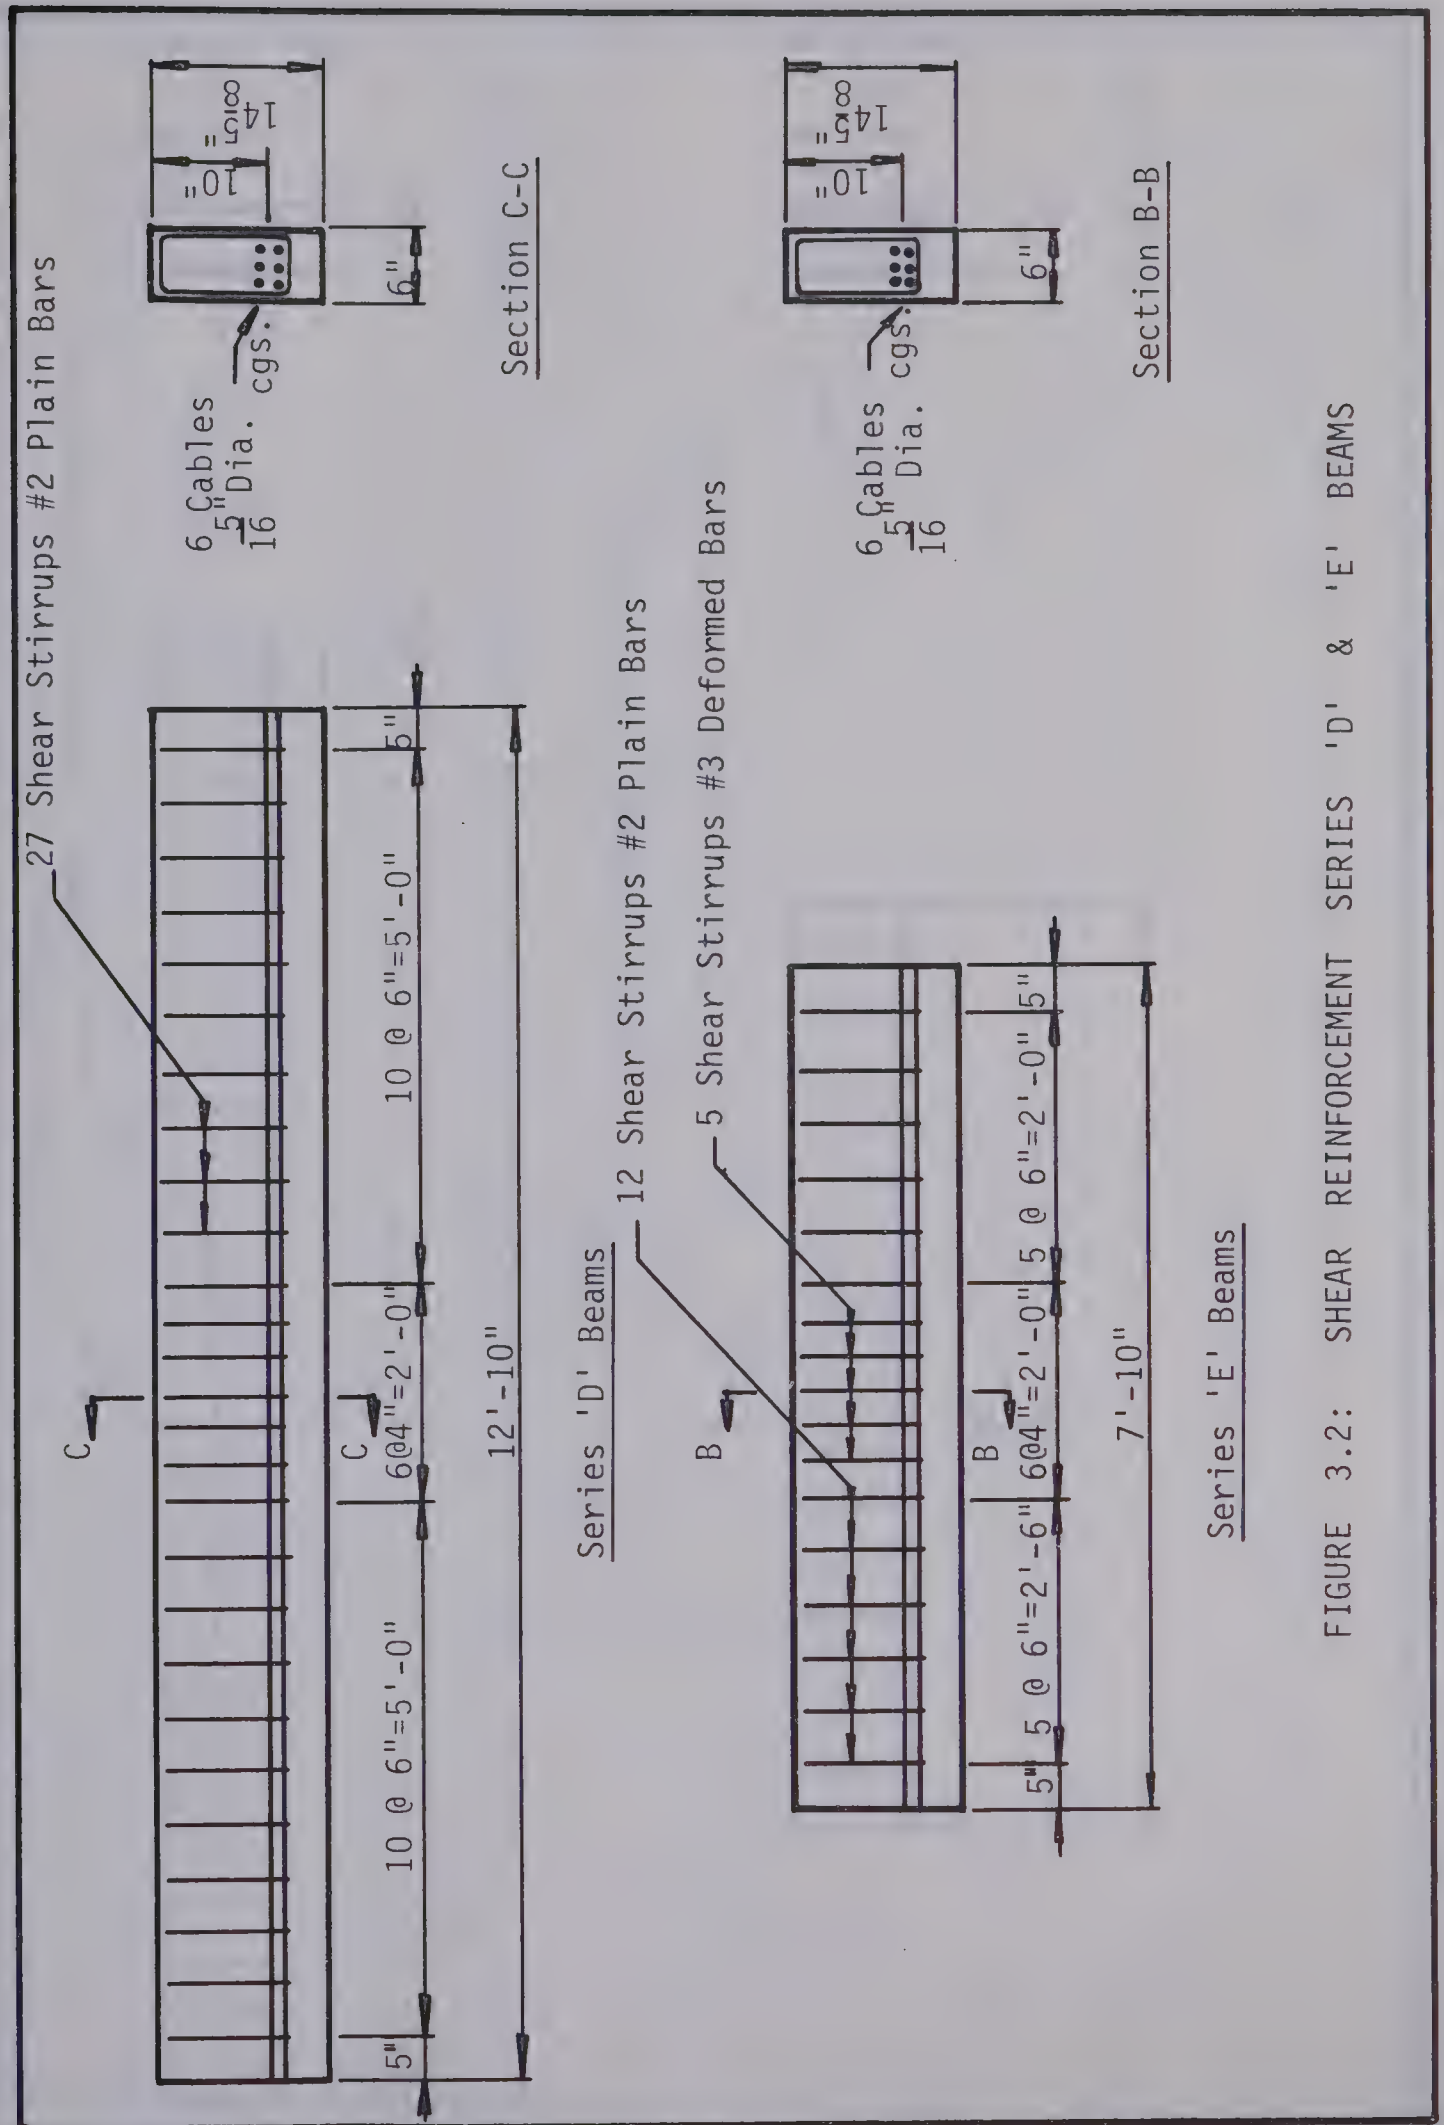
SHEAR REINFORCEMENT SERIES 'D' & 'E' BEAMS
